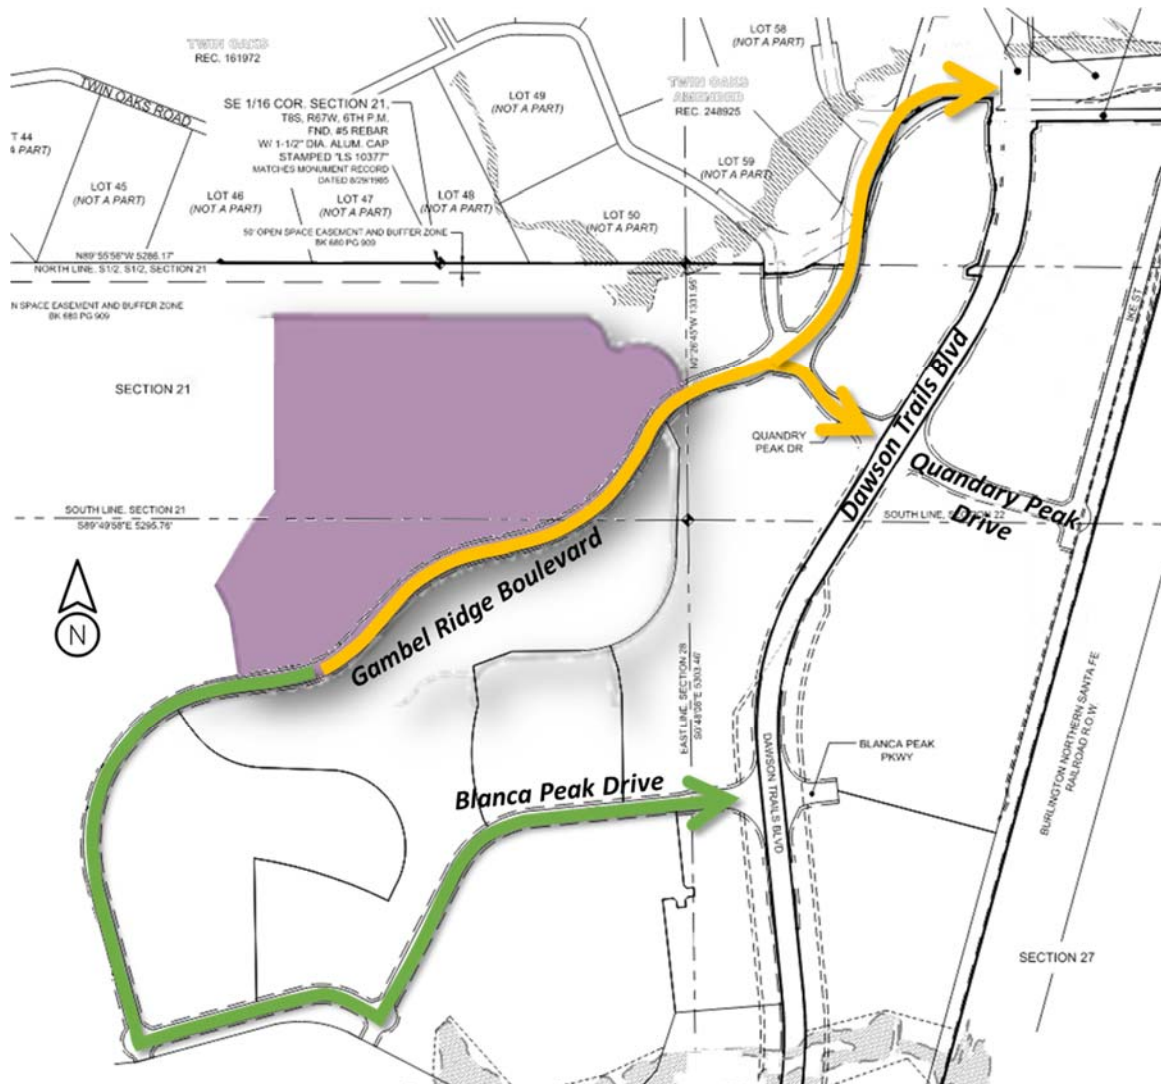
Connectivity between Planning Area B-1 and Dawson Trails Boulevard
